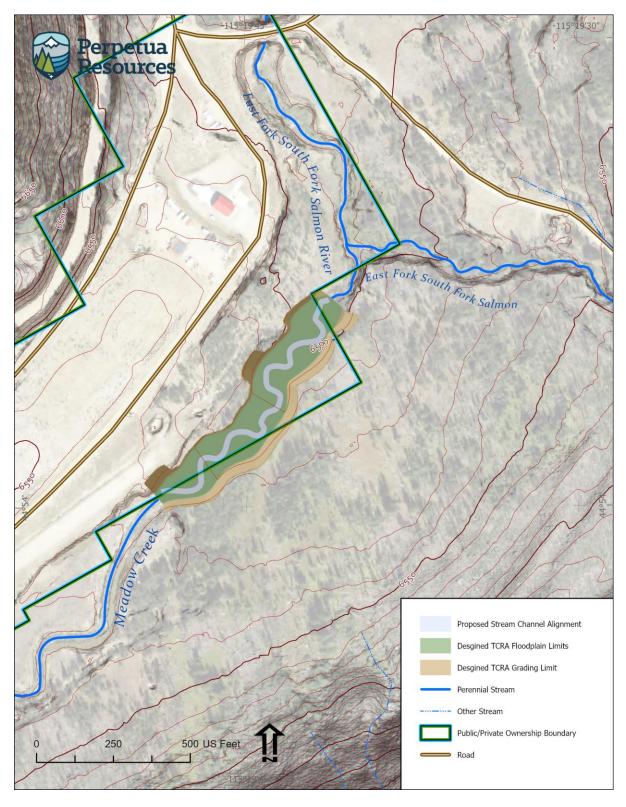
Design Alternative T1 – Lower Meadow Creek
